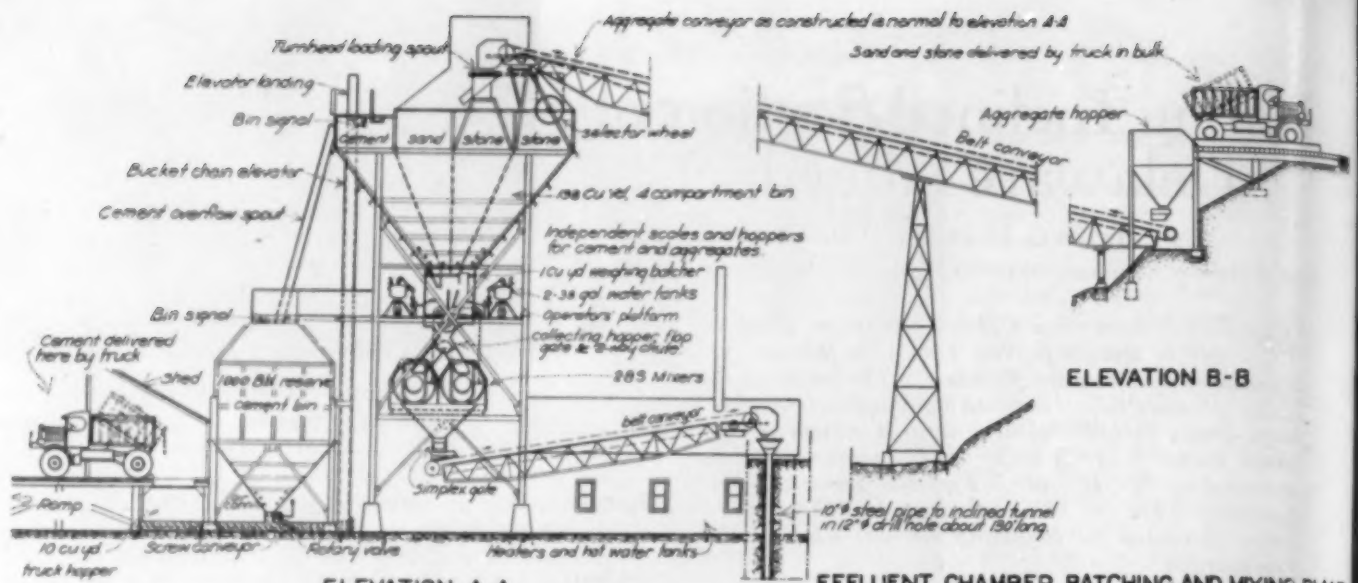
SECTIONAL ELEVATIONS OF PLANT AND EQUIPMENT FOR CONCRETING
